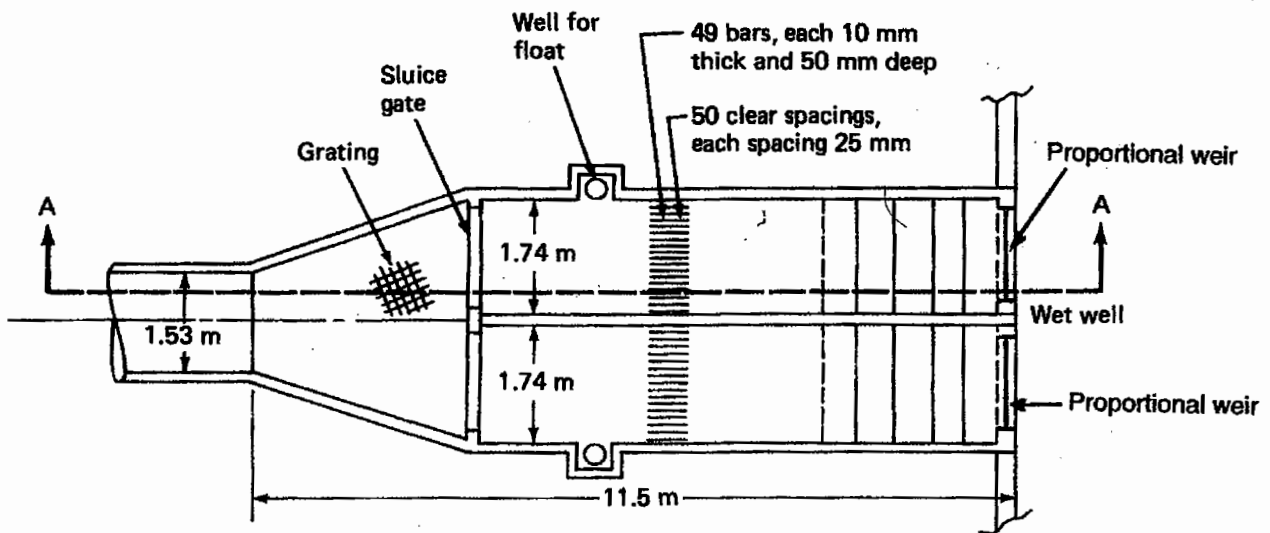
Design Details of Bar Rack. All Elevations Are with Respect to the Datum at the Floor of the Rack Chamber.
